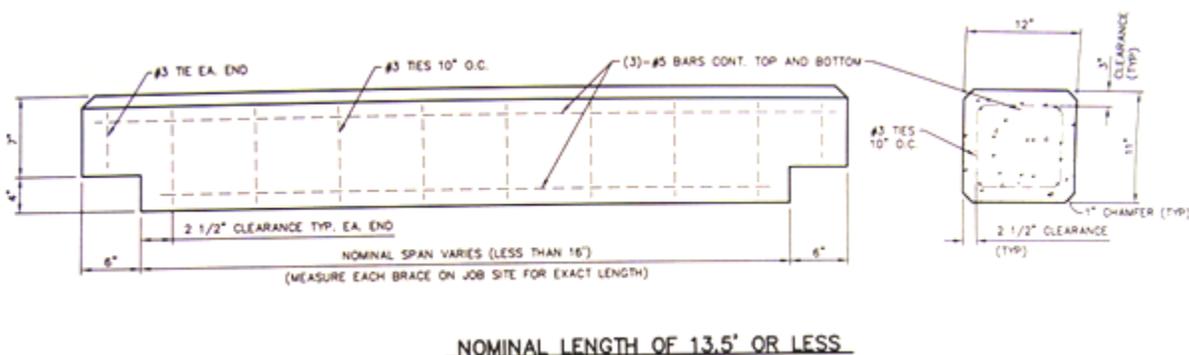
Typical Brace Elevation and Section. Design by Brown and Mitchell, Gulfport, MS
